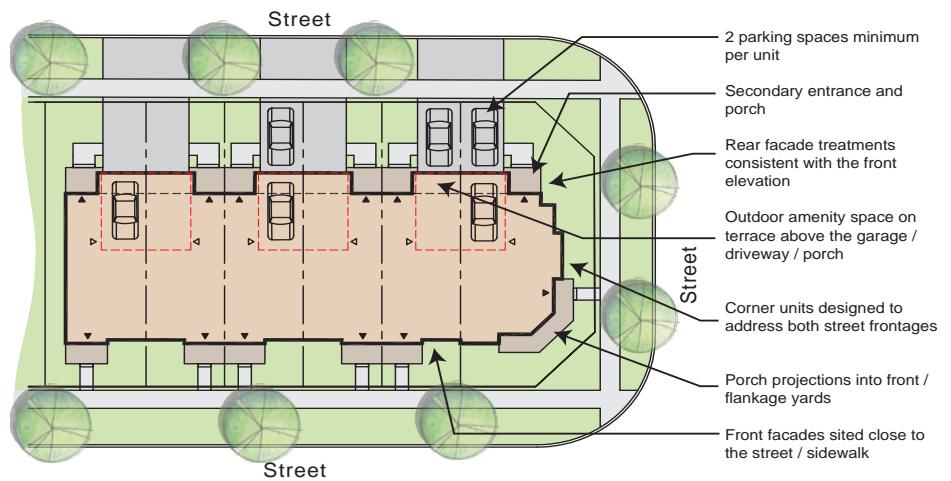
Conceptual plan layout for double frontage townhouses
